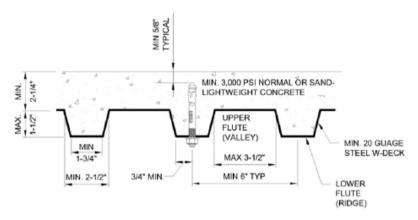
B-INSTALLATION IN THE SOFFIT OF CONCRETE OVER METAL DECK FLOOR AND ROOF ASSEMBLIES - B DECK12
